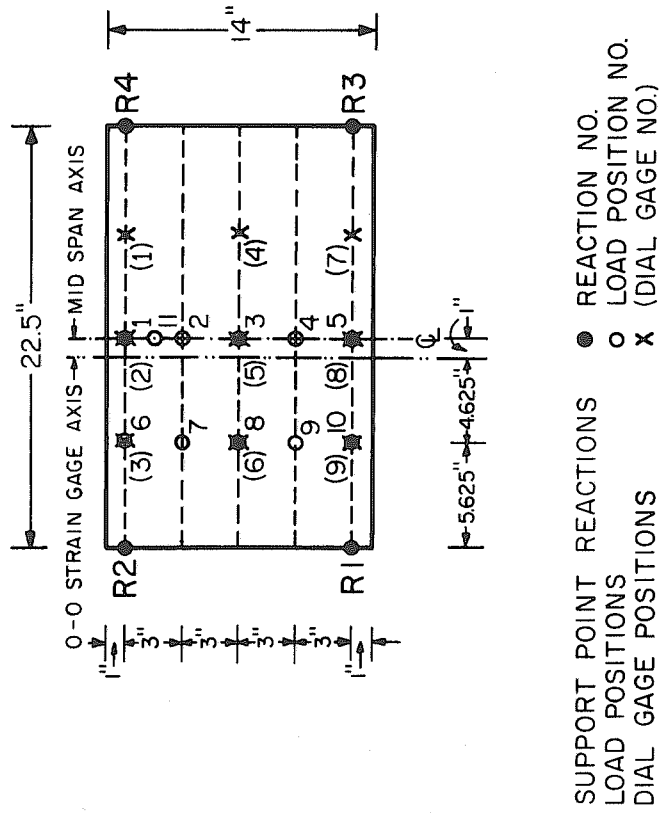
RECTANGULAR BOX GIRDER BRIDGE MODEL NO. 5,
